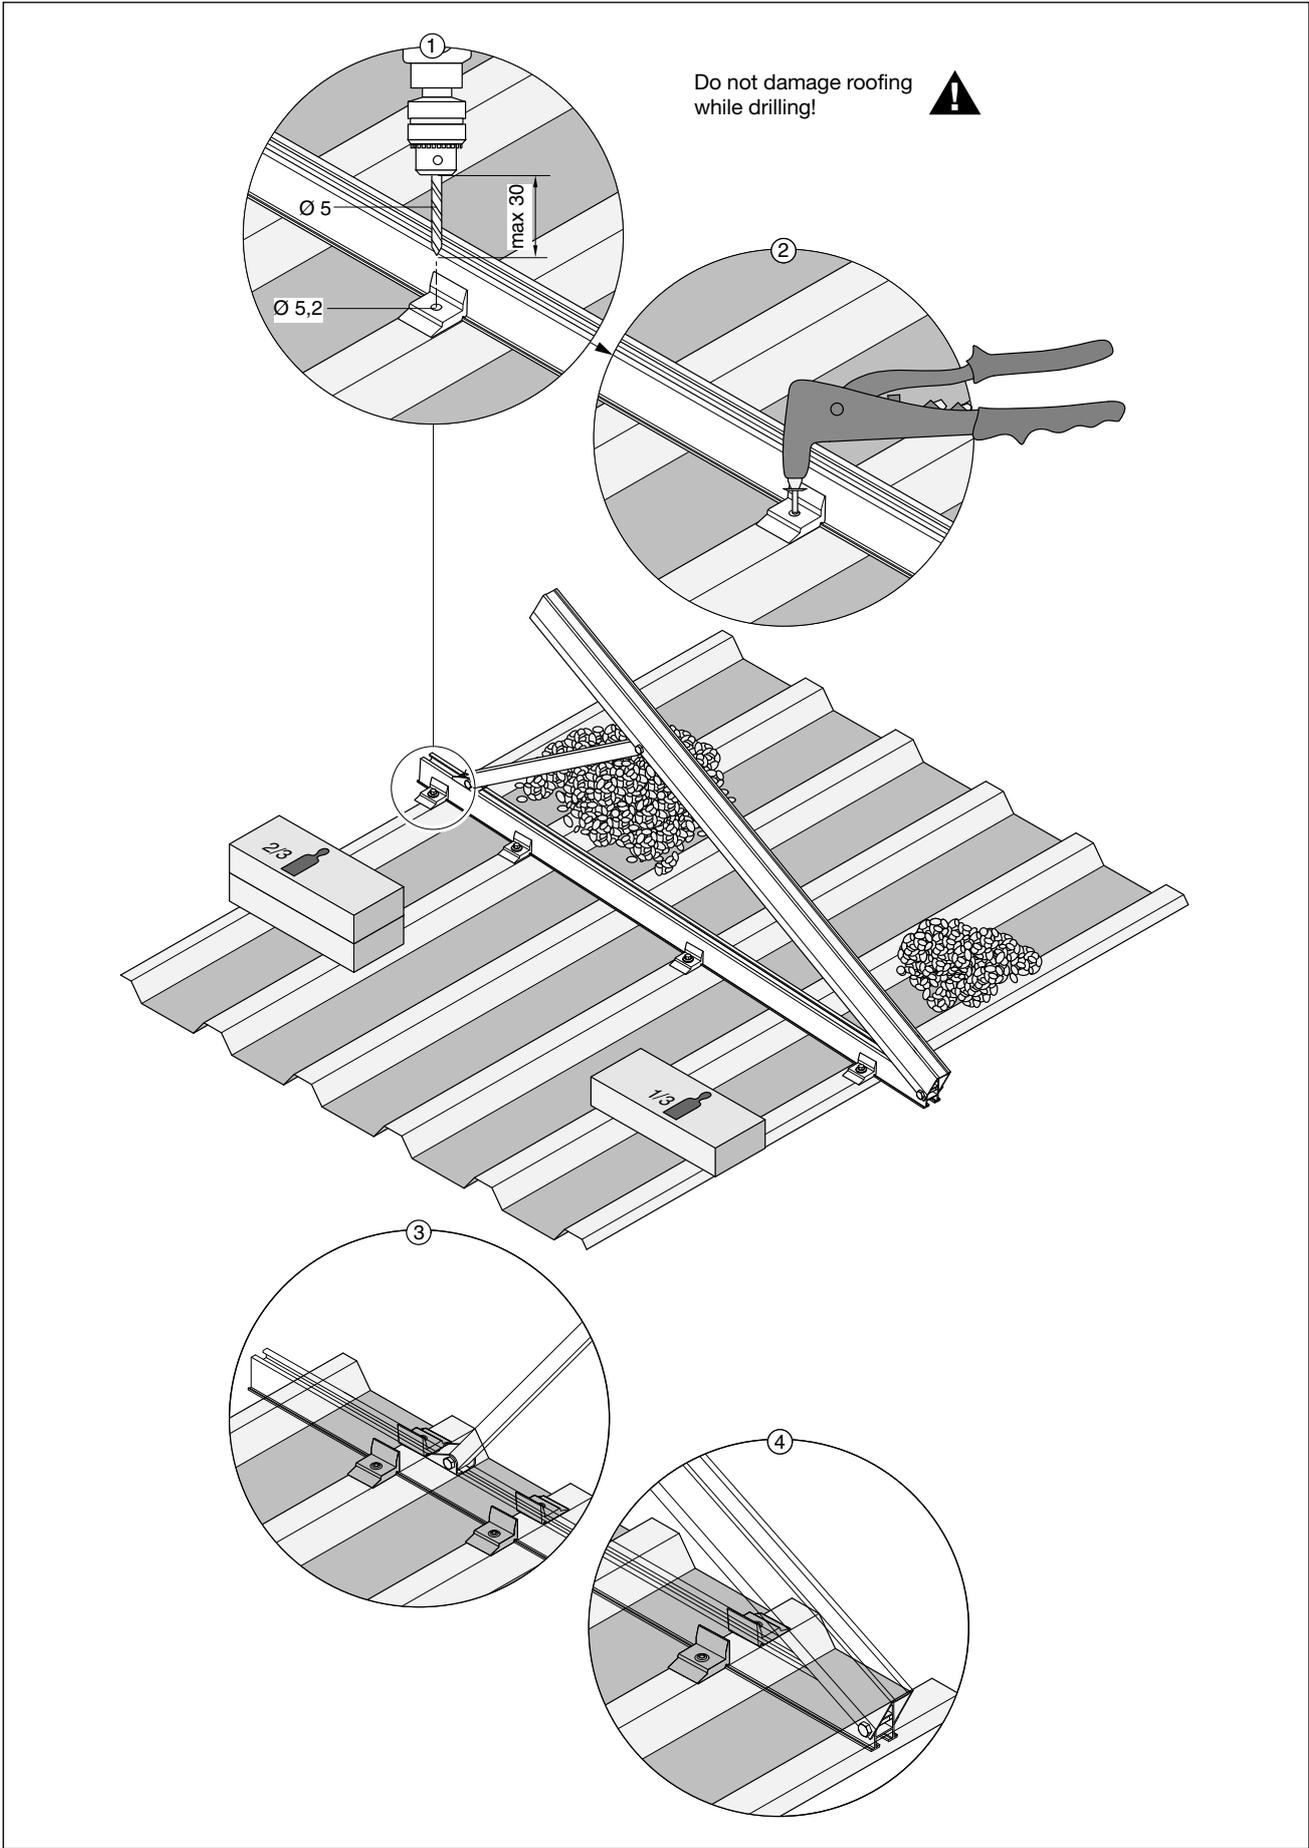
Fixing of the mounting triangles on concrete blocks
